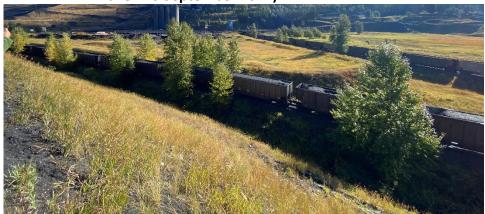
Lagoon B crest and embankment. (Looking west – Taken 20 September 2022)
